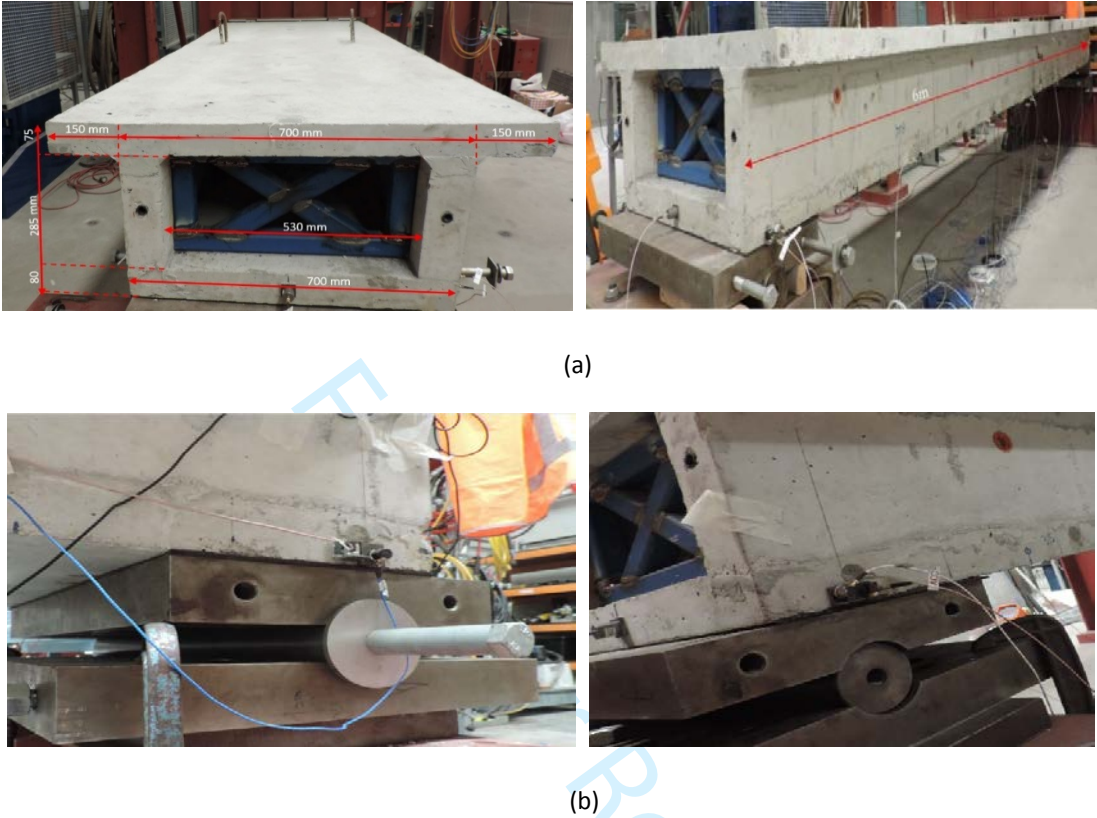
The BGB details: (a) BGB's dimensions and (b) Boundary conditions in BGB as Roller (left) and Pin (right).
